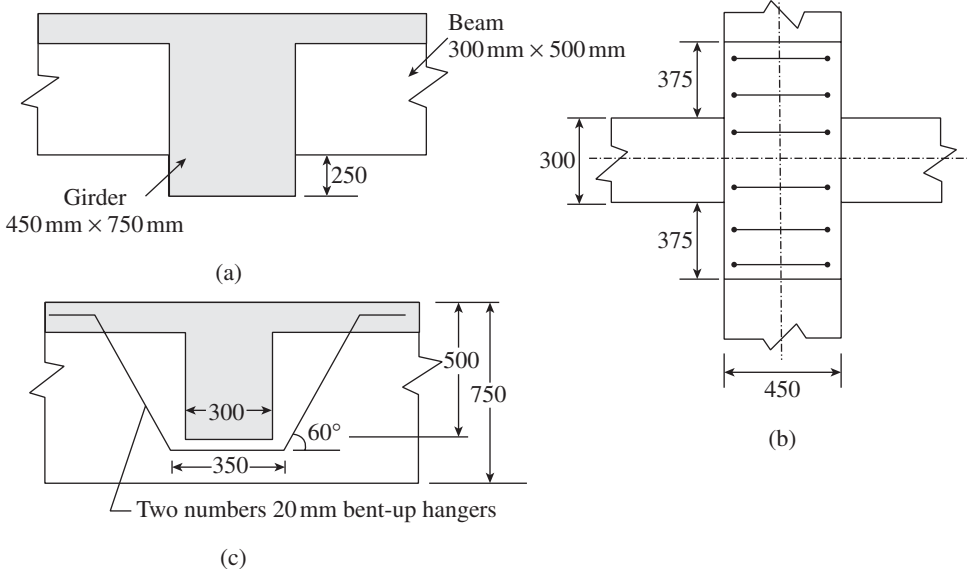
Hanger stirrups of Example 19.2 (a) Beam-girder joint (b) Plan view of joint zone (c) Alternate bent-up hangers
